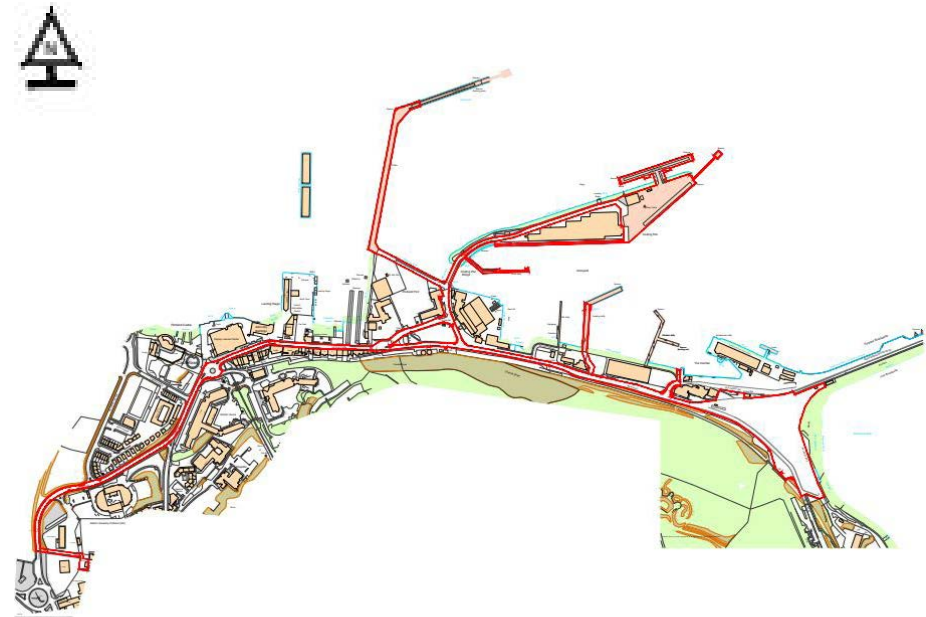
Site Plan submitted with Application WP/20/00692/DCC
